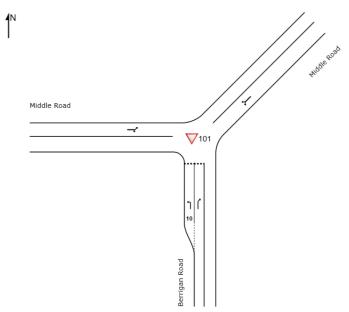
Geometric Layout – Middle Road/ Berrigan Road intersection
